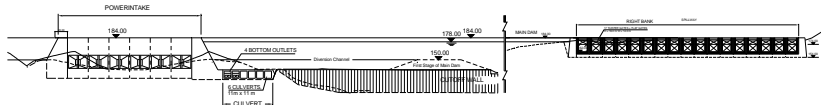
Proposed Spillway on Right bank and Diversion culverts /Bottom outlet on Left bank
